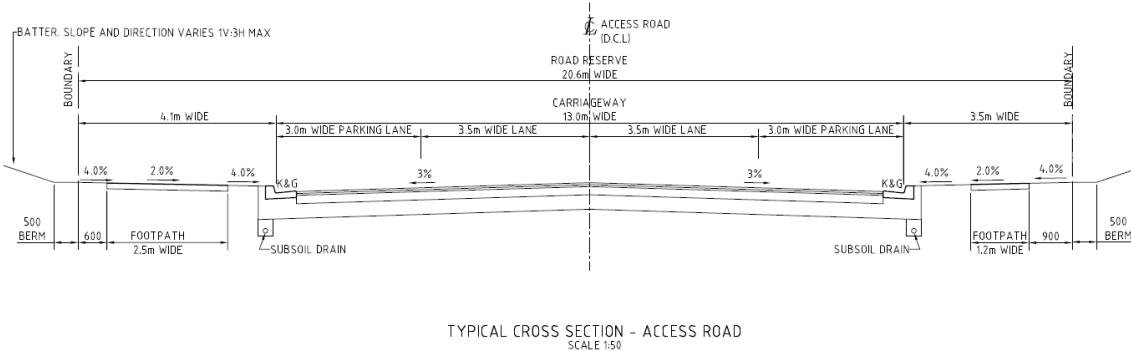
Estate Road – Typical Cross Section (as adopted)
